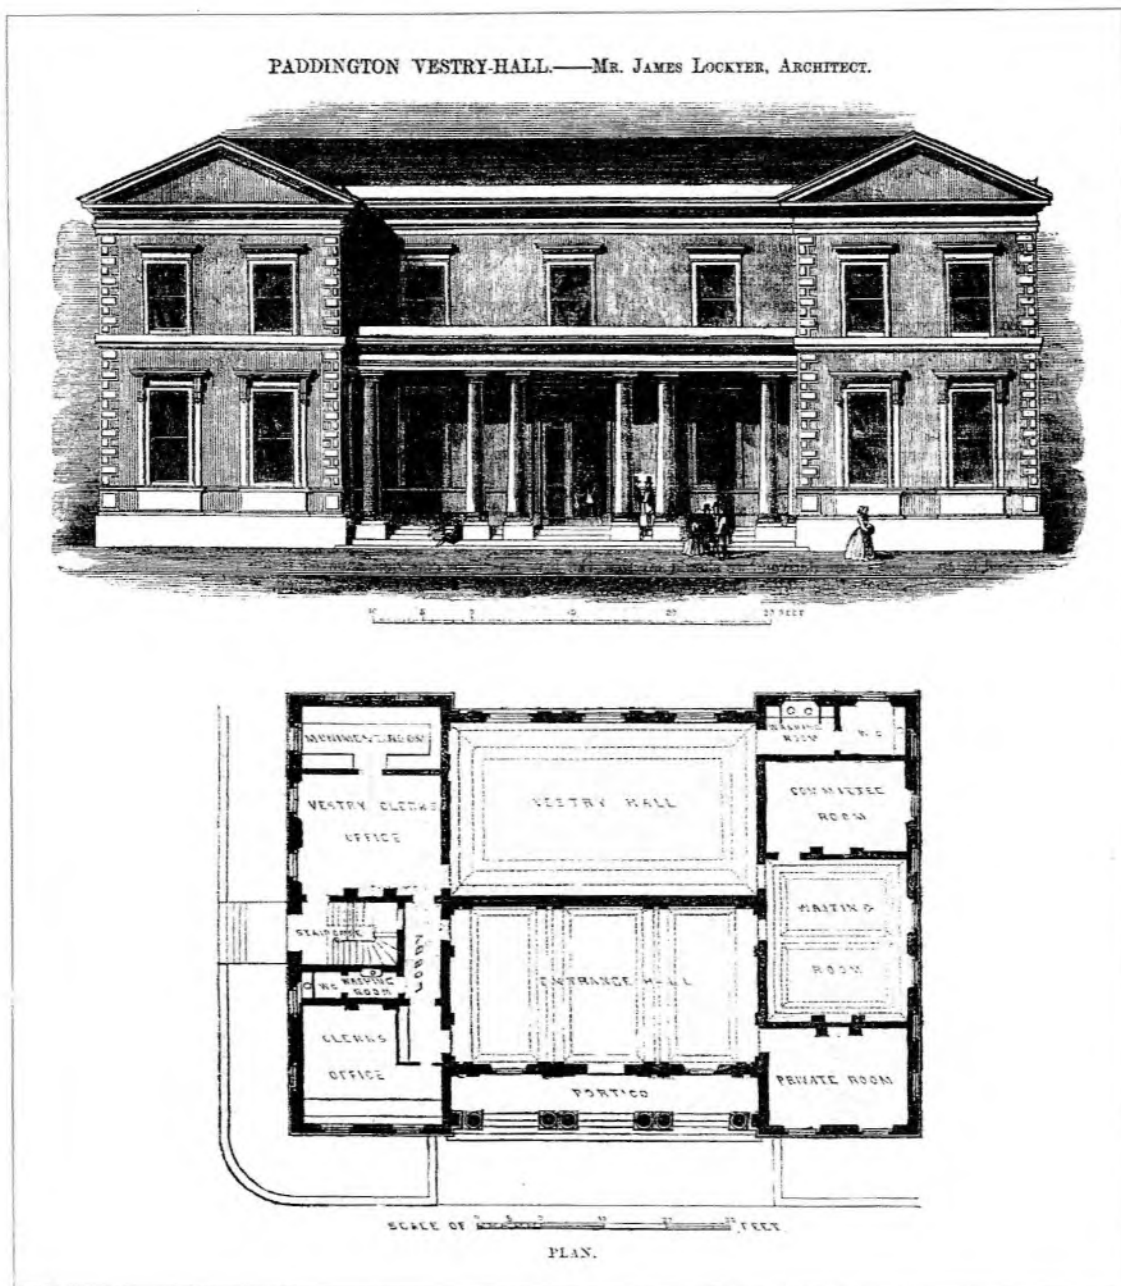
Paddington Vestry Hall (1853: James Lockyer, demolished 1965): elevation and plan.
